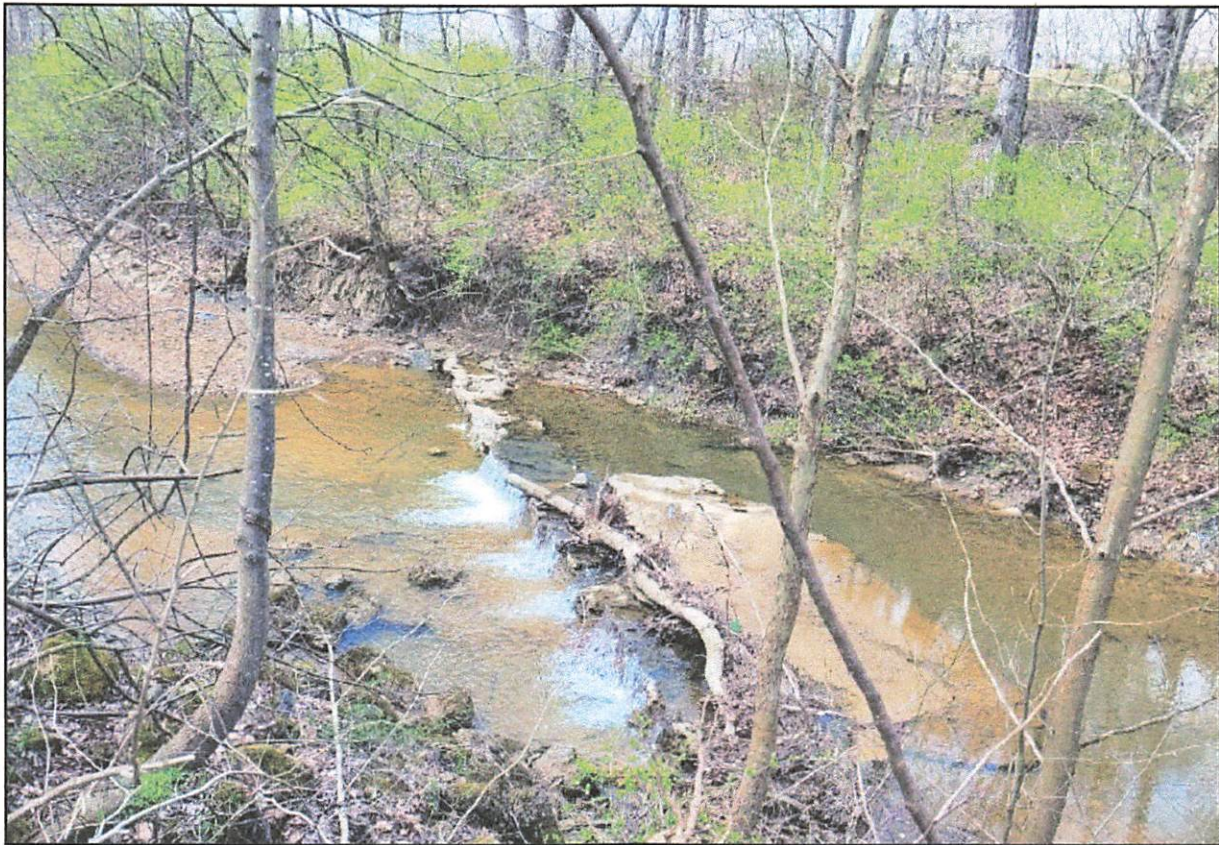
Concrete encasement at water main crossing of Millers Run along Millers Run-Fallen Timber Road
